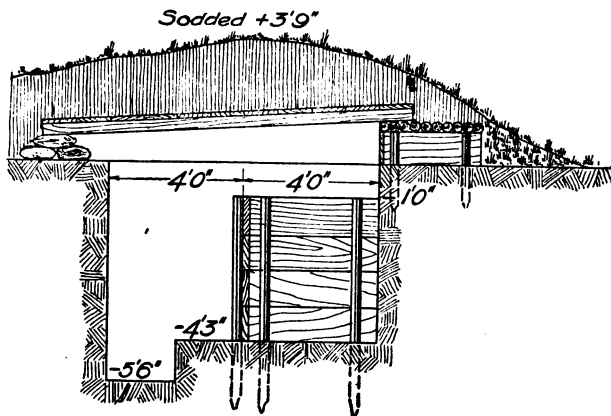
MACHINE GUN EMPLACEMENT, OVERHEAD COVER
